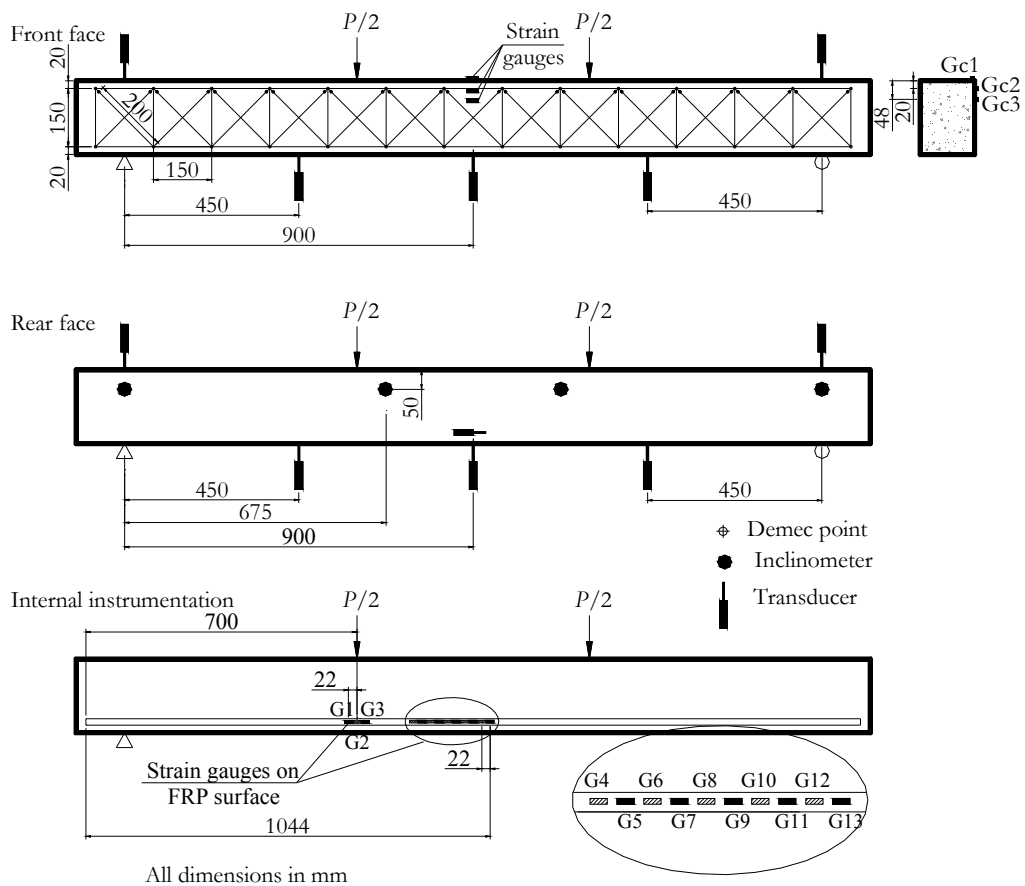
Instrumentation details for beam C3-316-D1-B.
